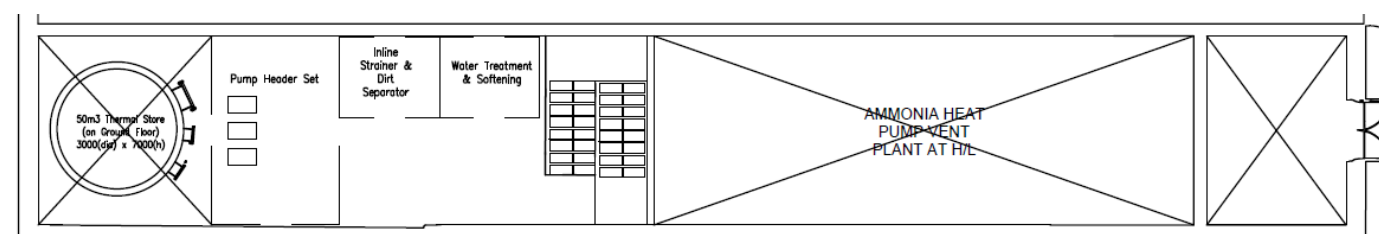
Concept design for the ground floor of the plant area within the MSCP.
